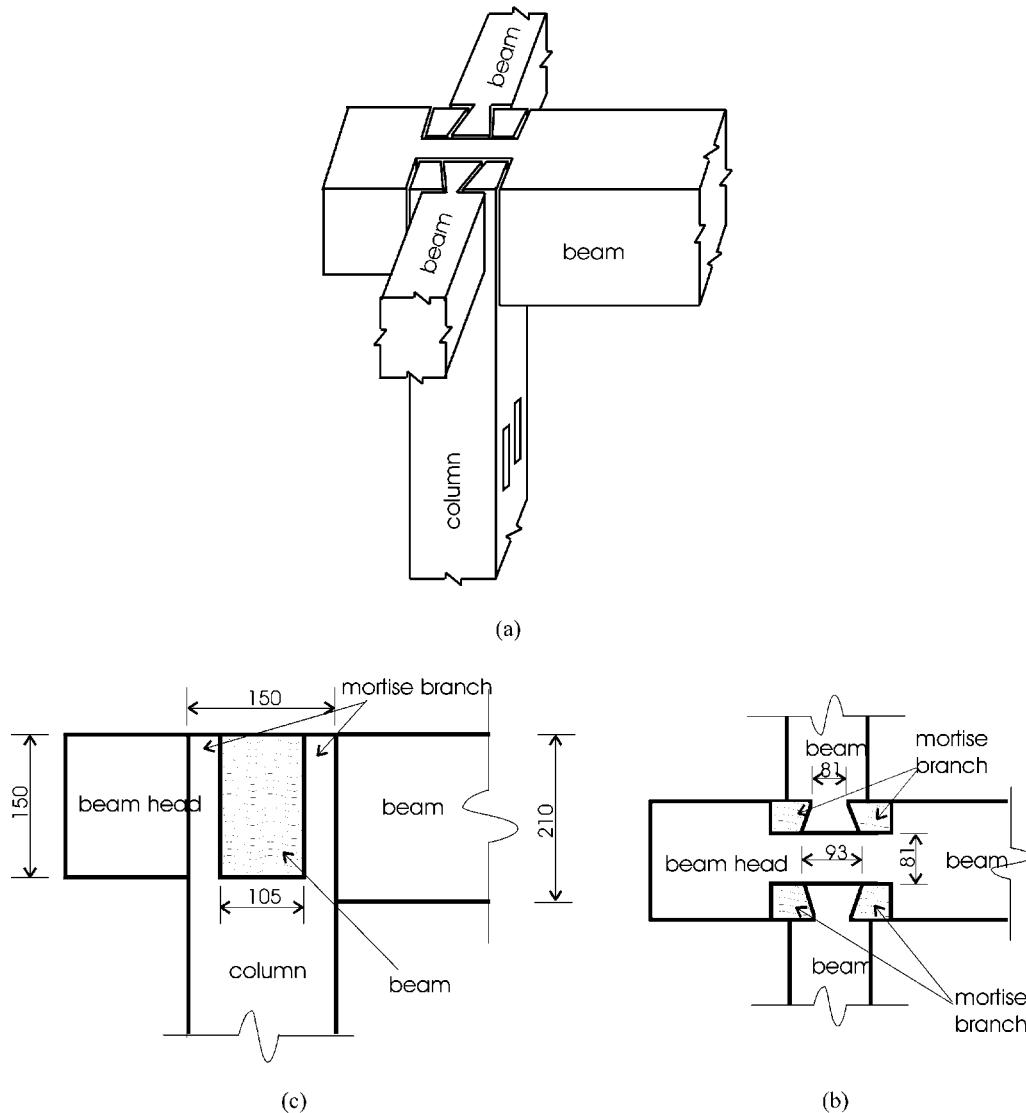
Details of tenon joint at the top of the column (unit: mm); (a) perspective view, (b) side view; (c) plan view
